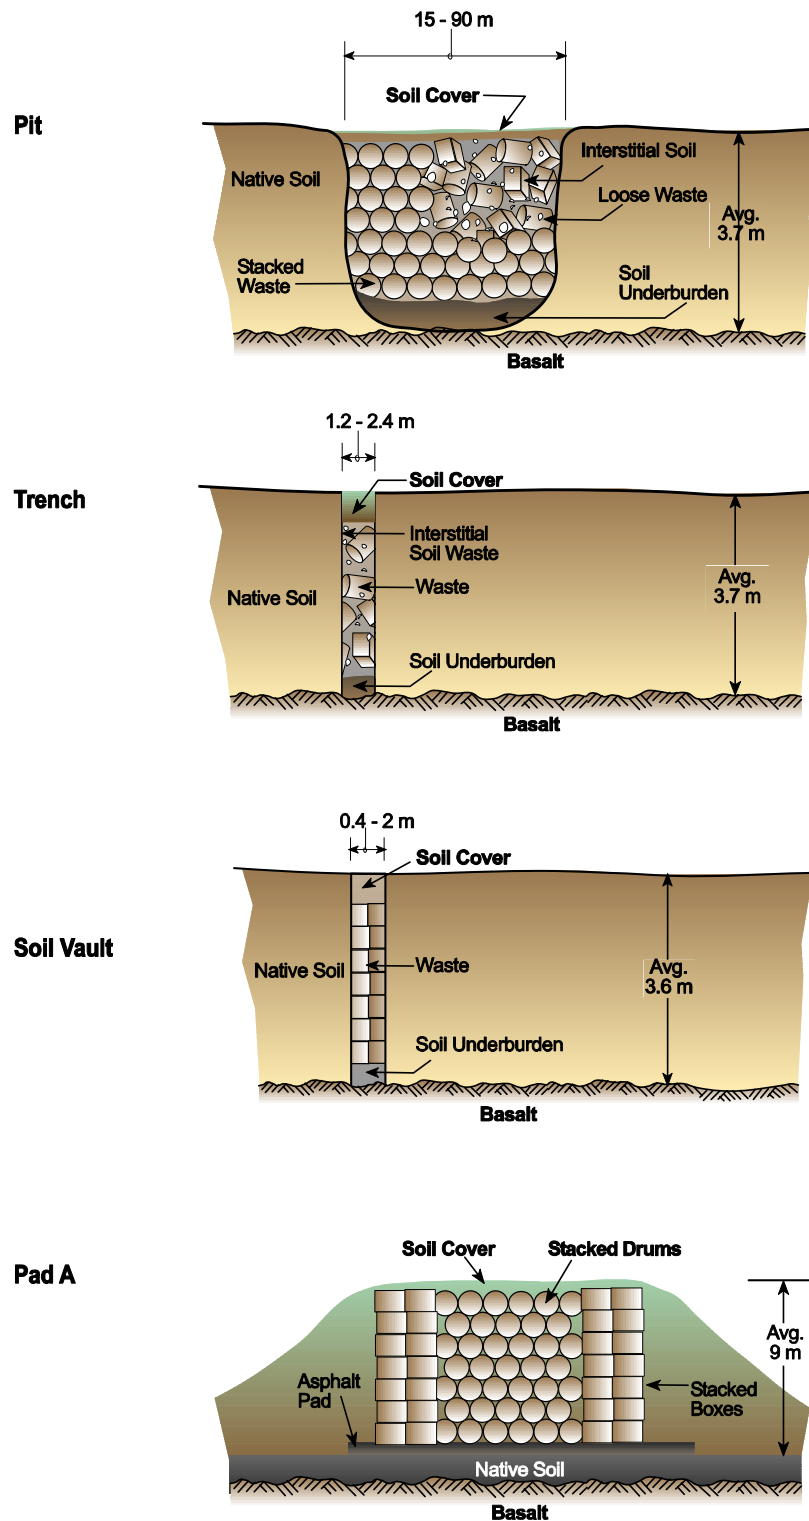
Cross sections of typical waste pit, trench, vault, and Pad A within the Subsurface Disposal Area located at the Radioactive Waste Management Complex.
